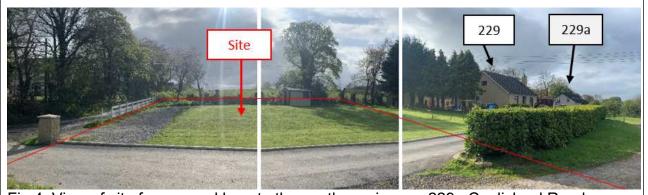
View of site from gravel lane to the south serving no. 229a Coalisland Road.
